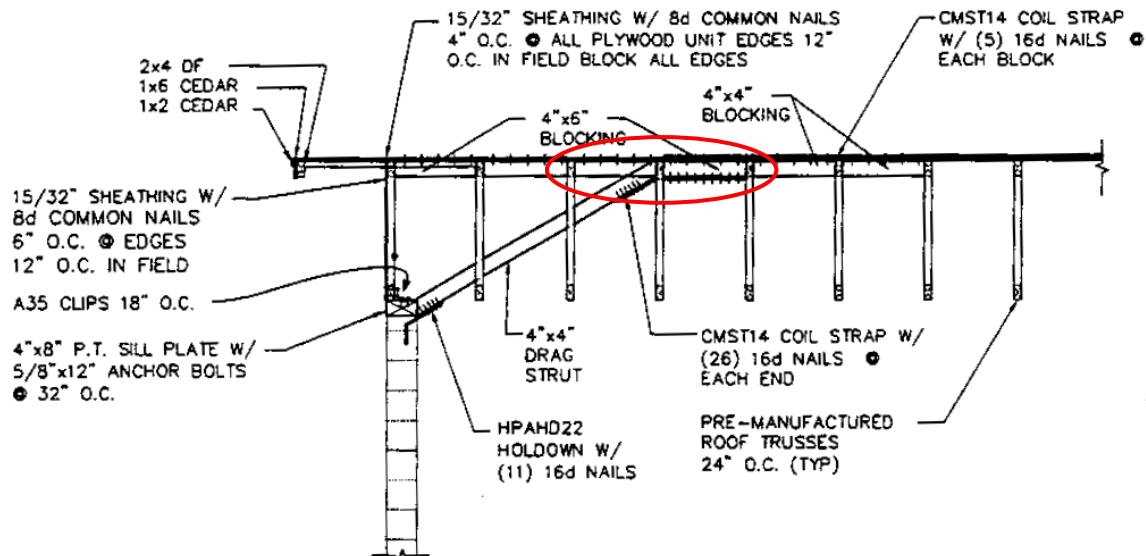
Inadequate Connection between Blocking and Roof Truss
